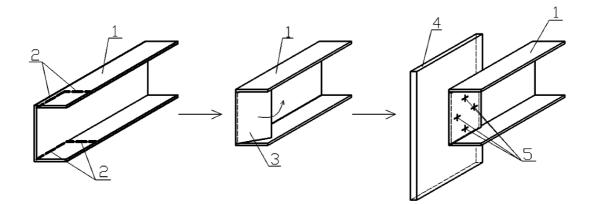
A way to join open thin-walled elements in the bend type:1 is a thin walled profile; 2 is a longitudinal and cross cuts; 3 is a bent area of the profile wall;4 is the plate; 5 is a self-drilling screw
